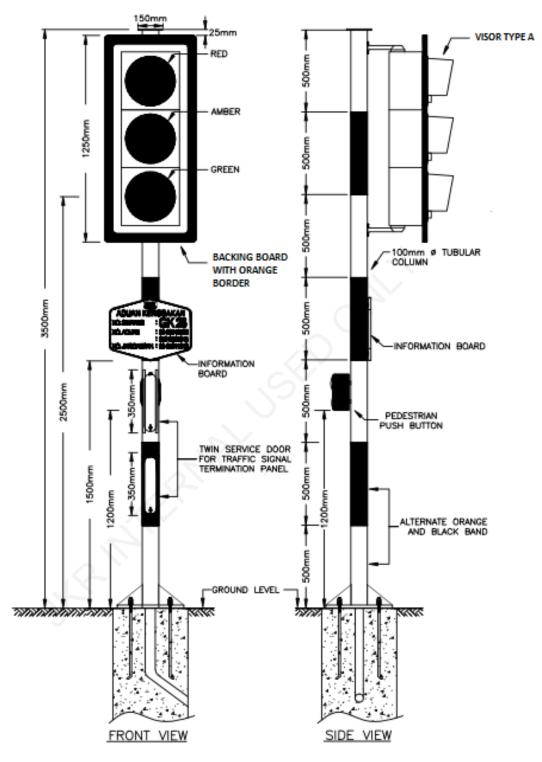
HEIGHT OF COLUMN MOUNTED SIGNAL HEAD Source : Standard Drawings for Road Works Section 8: Traffic Signal System
